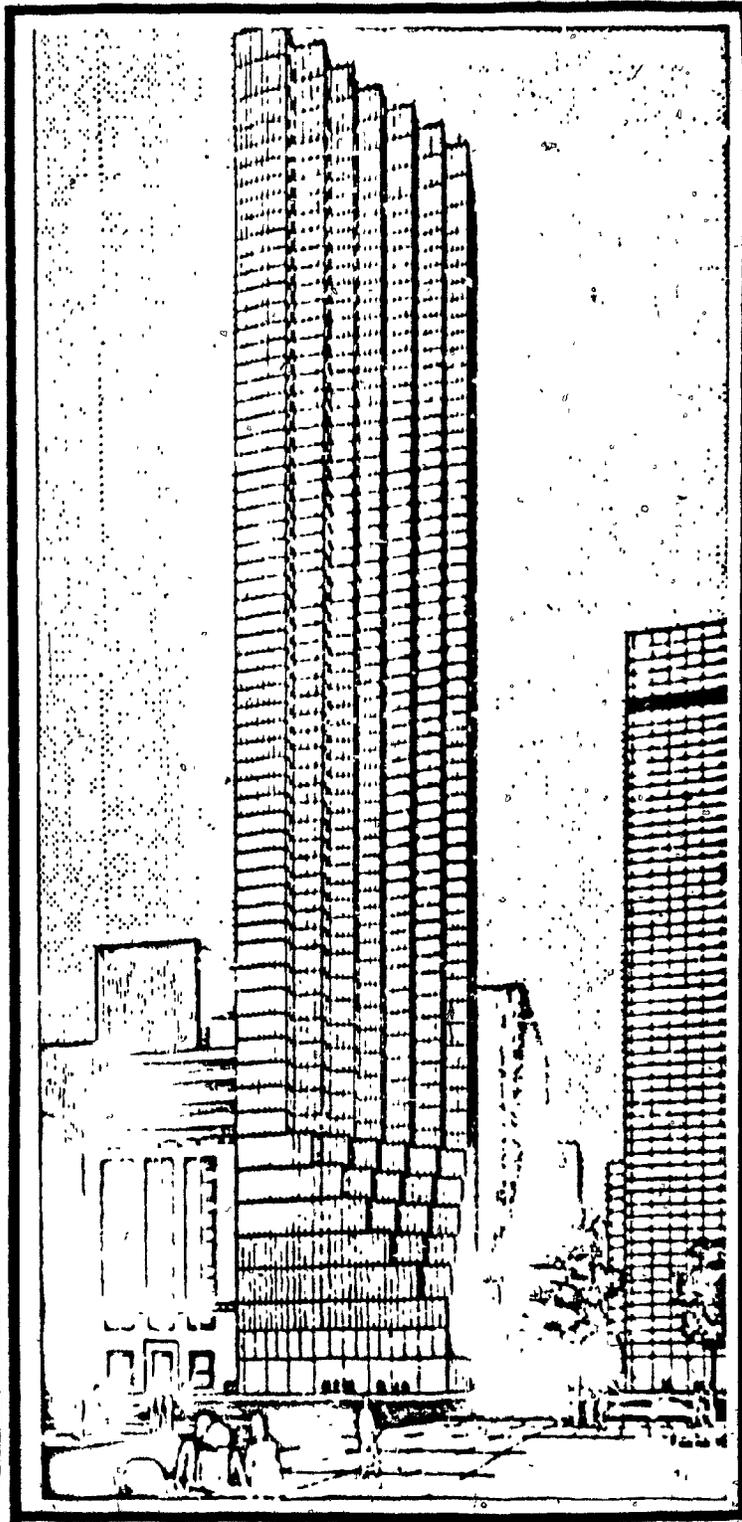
Proposed 60-storey MXD tower to be erected on Bonwit Teller site, New York City.
